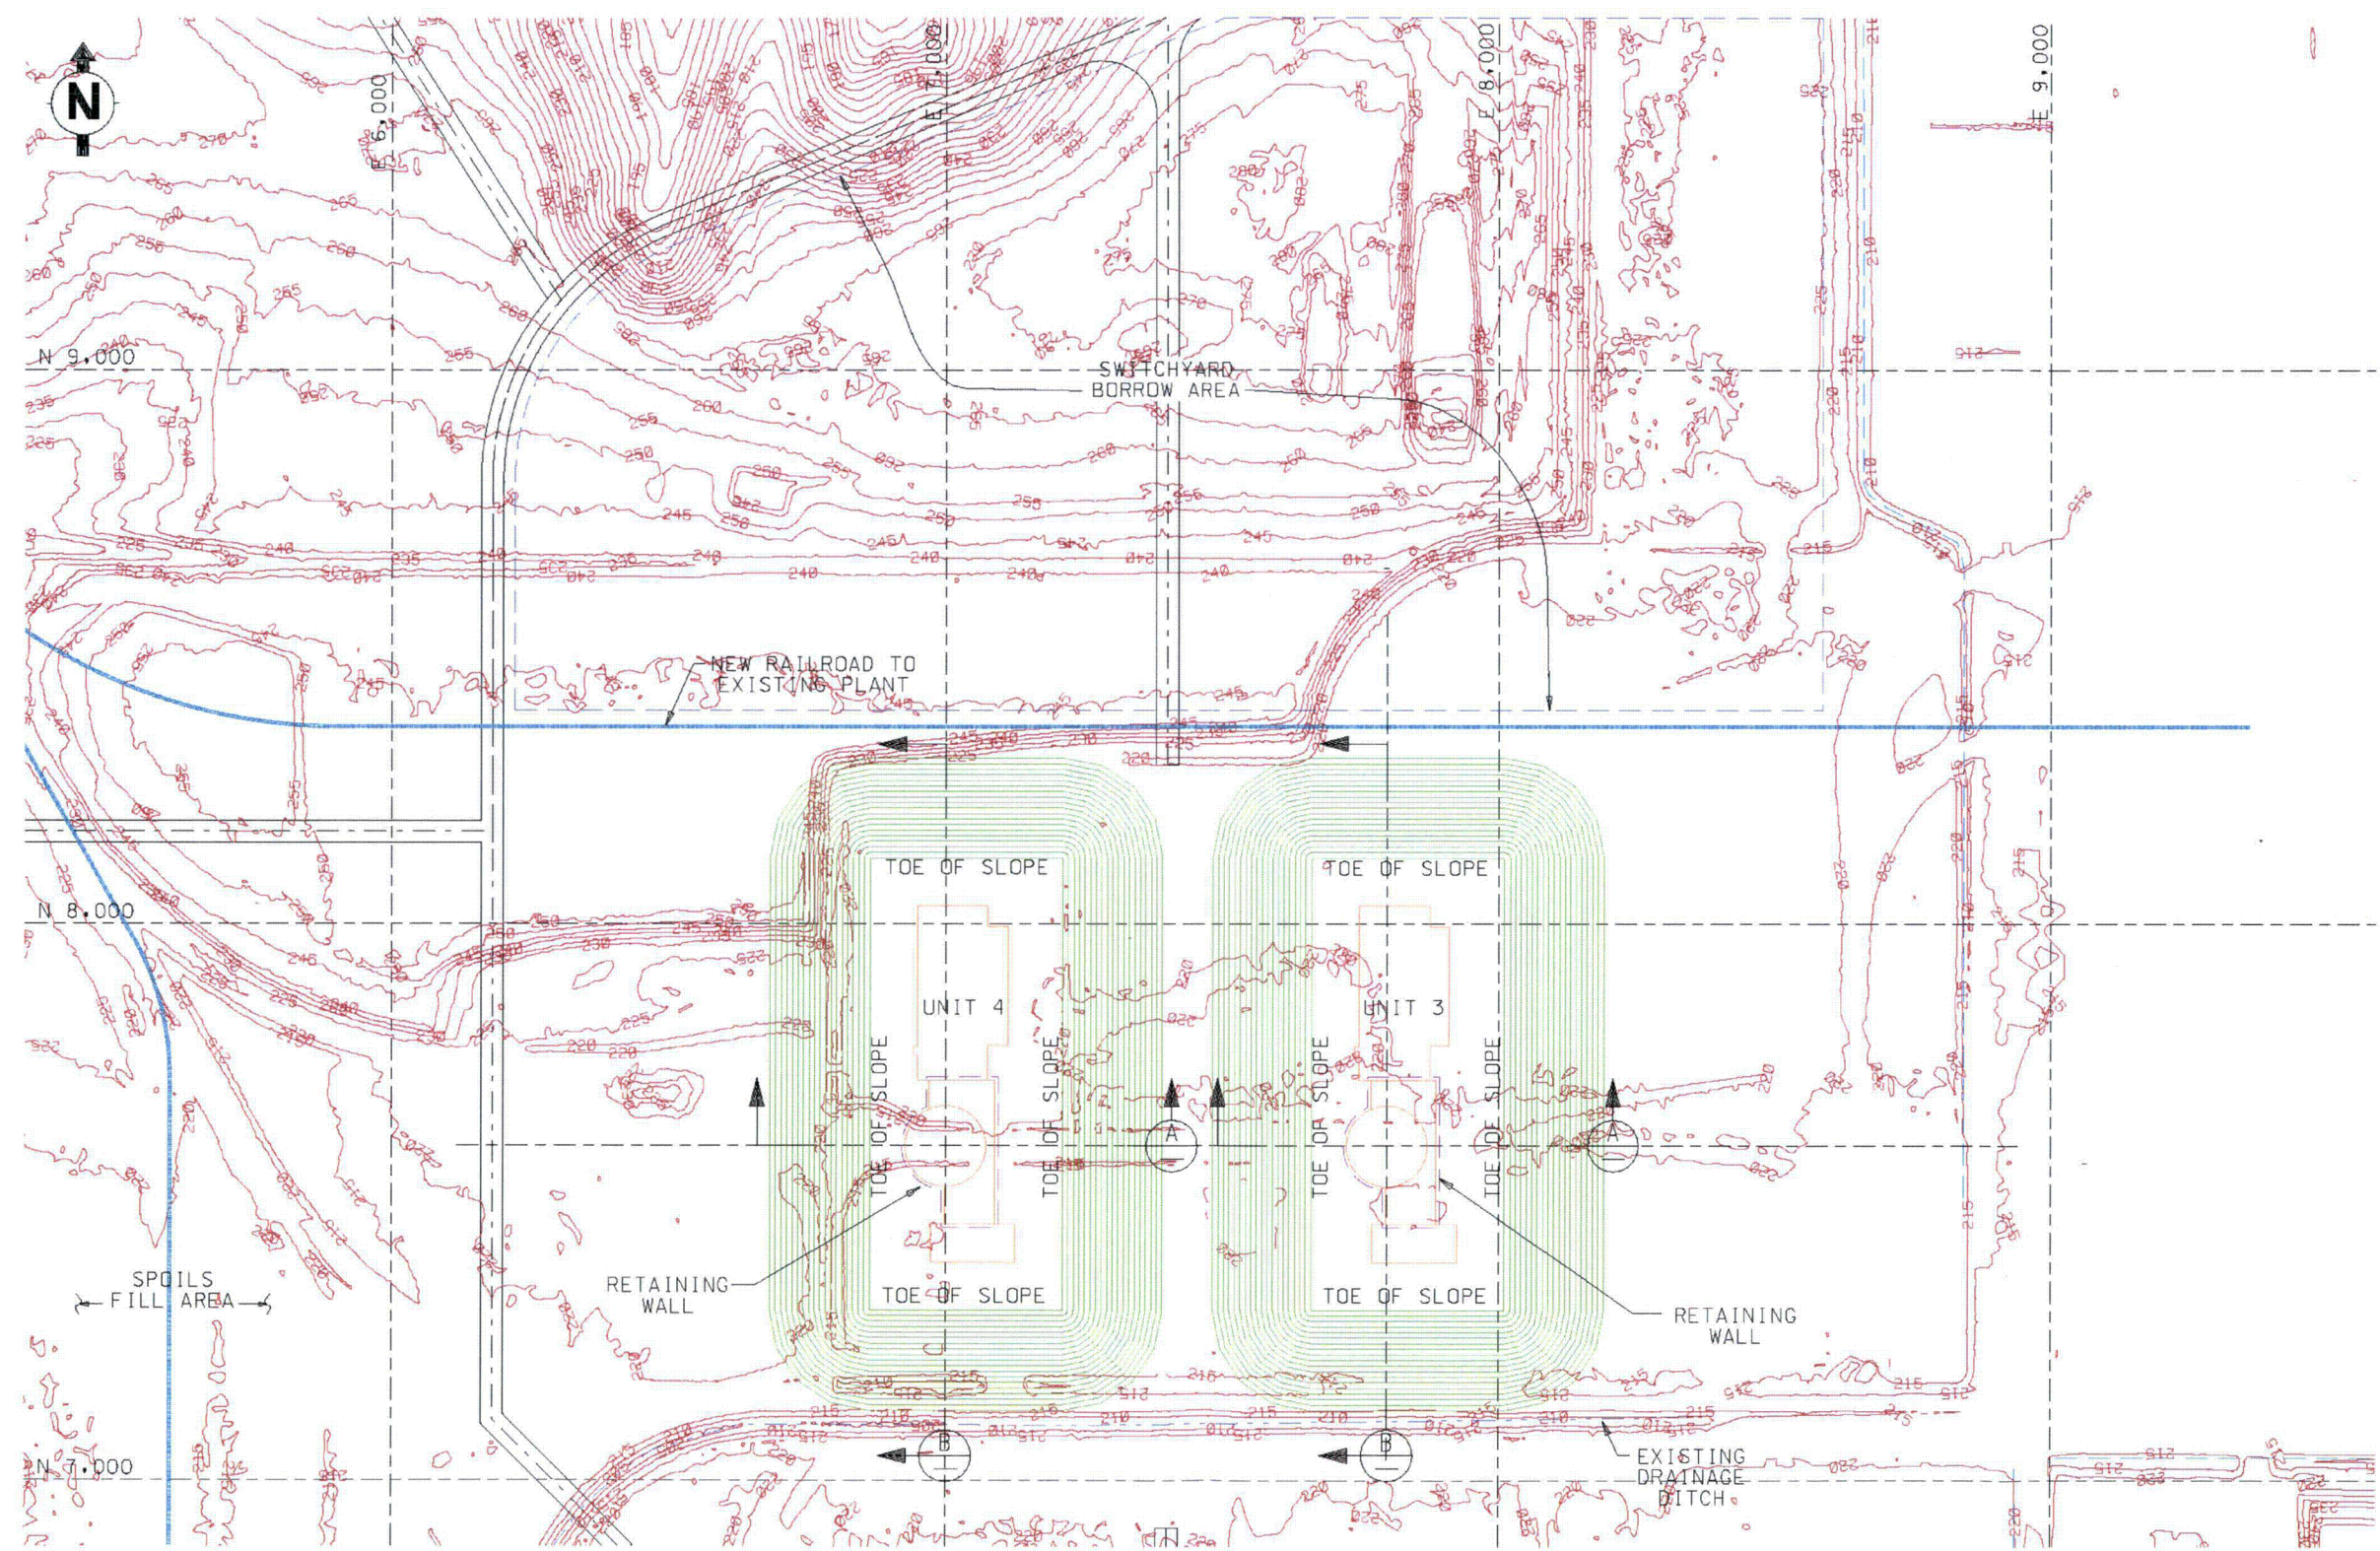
Power Block Excavation and Switchyard Borrow Area
